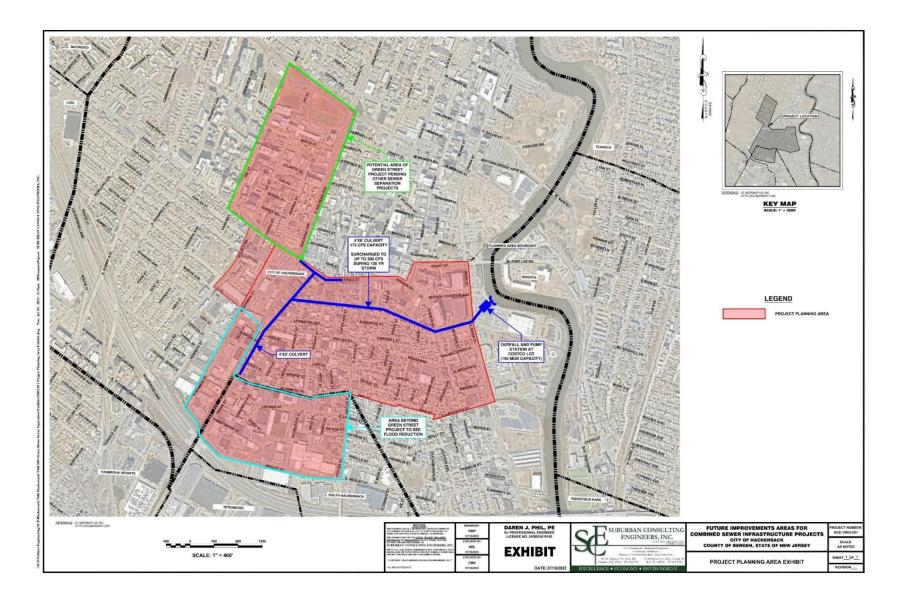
Green Street Stormwater Project Conceptual Alignment
